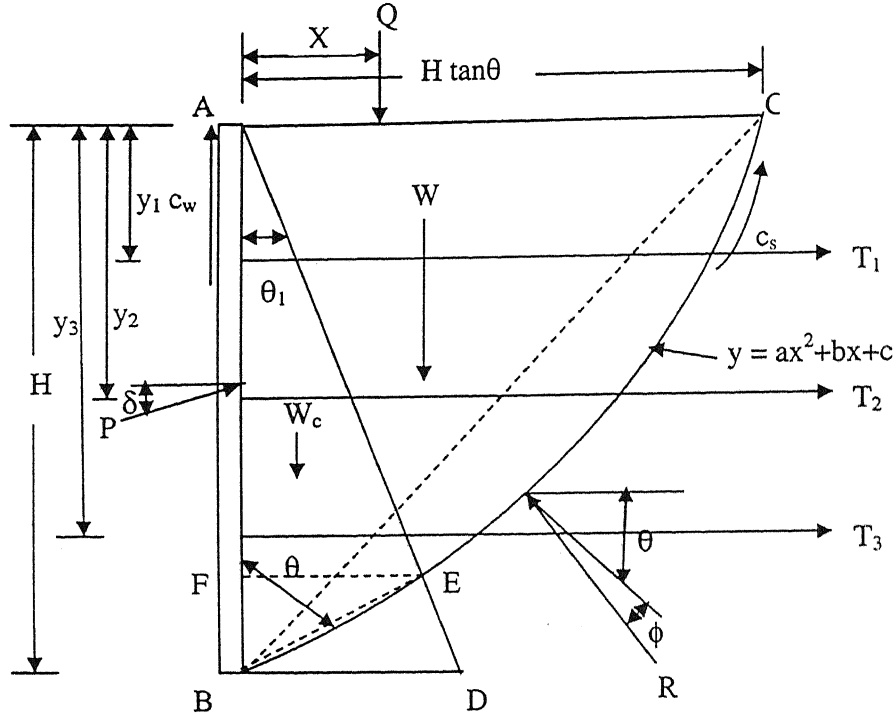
Forces acting on counterfort retaining wall (line load, reinforced backfill)
